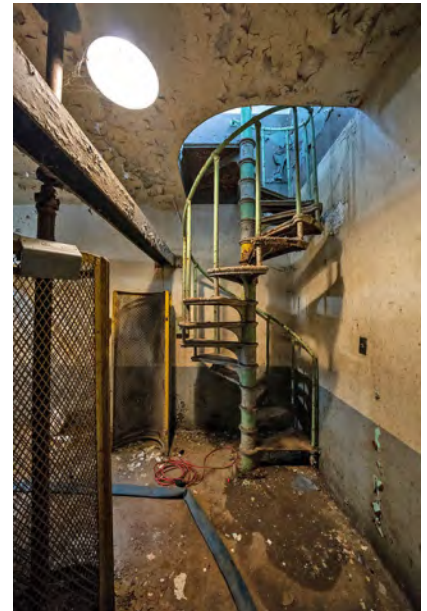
Sewage Pump House interior, first sub-floor, looking south.
